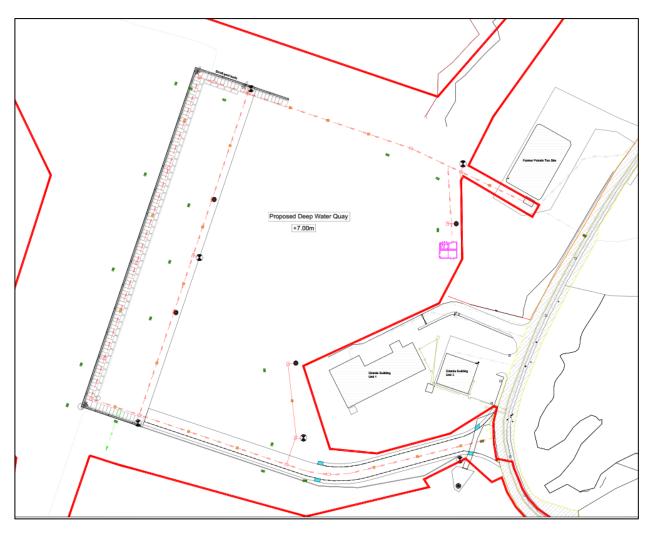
Substation Location (pink) and Electrical Layout (red dashed lines)
